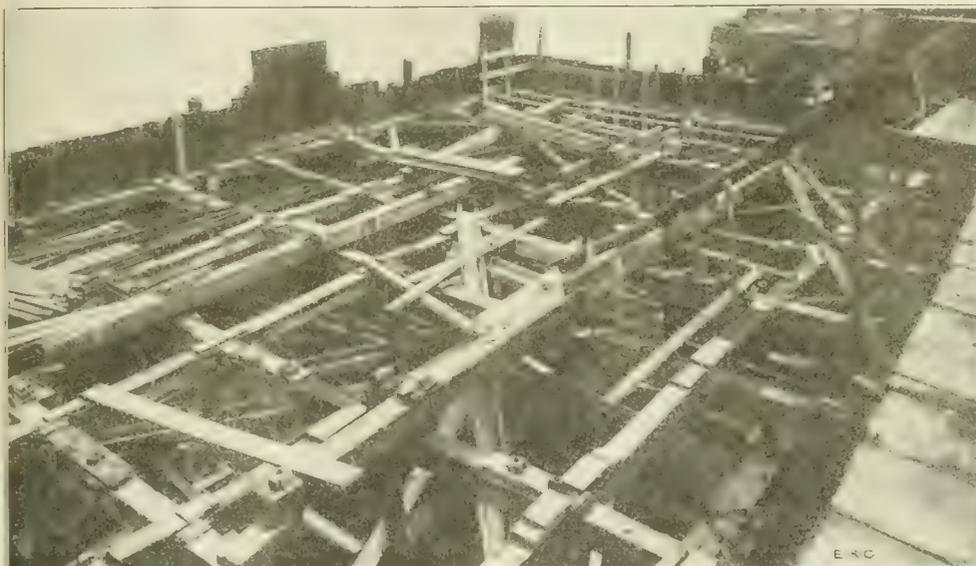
View from Northwest of West Cofferdam for Chicago Ave. Bridge, Showing Bracing and Concrete Chutes—Substructure Trusses Shown in Place.
